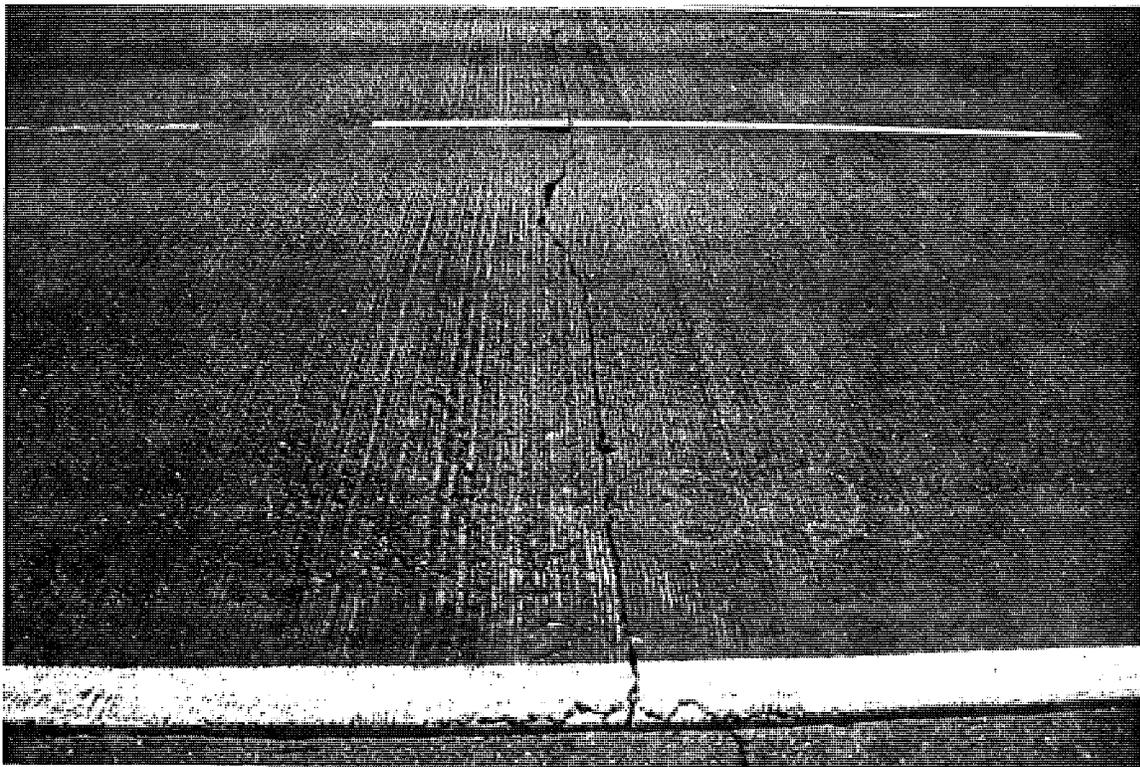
A typical third point full width crack showing the beginnings of spalling on CSN# 25132-06582A SB.
